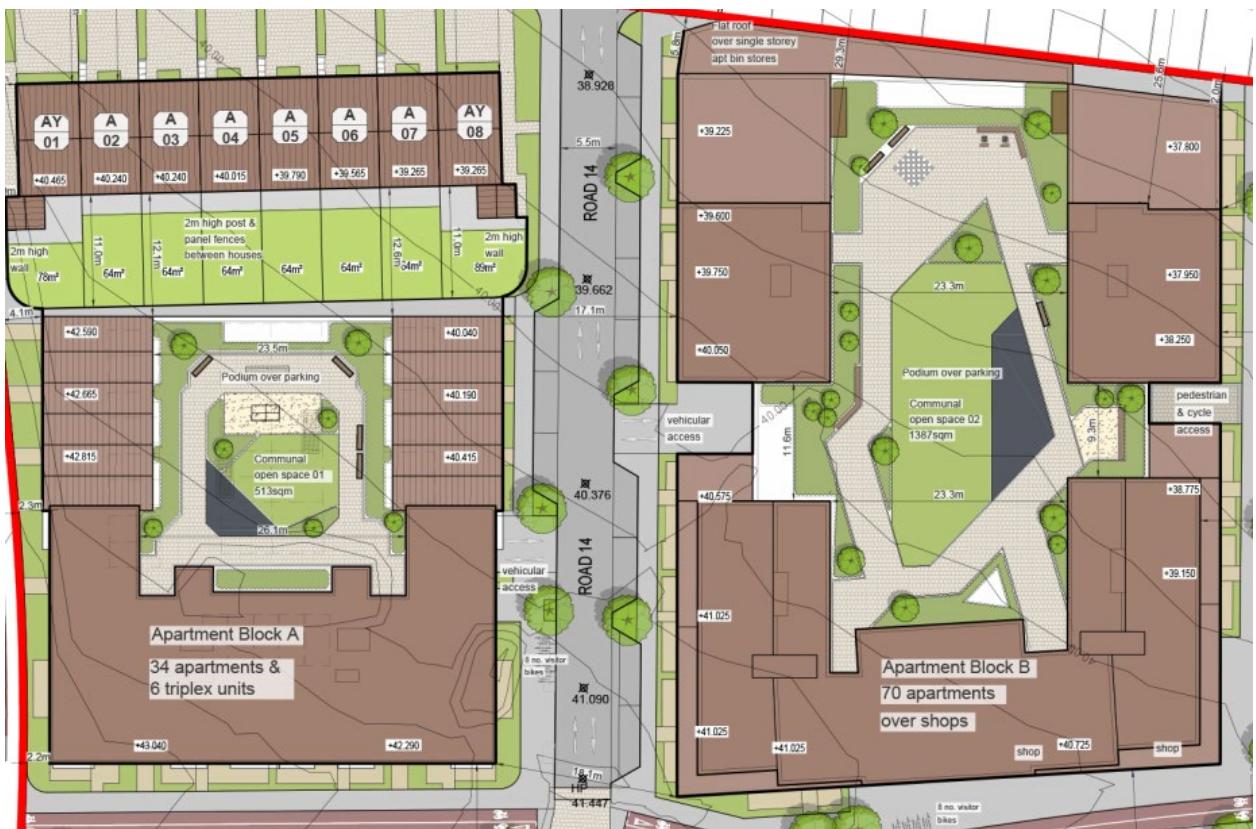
Proposed arrangement of Apartment Blocks A & B
